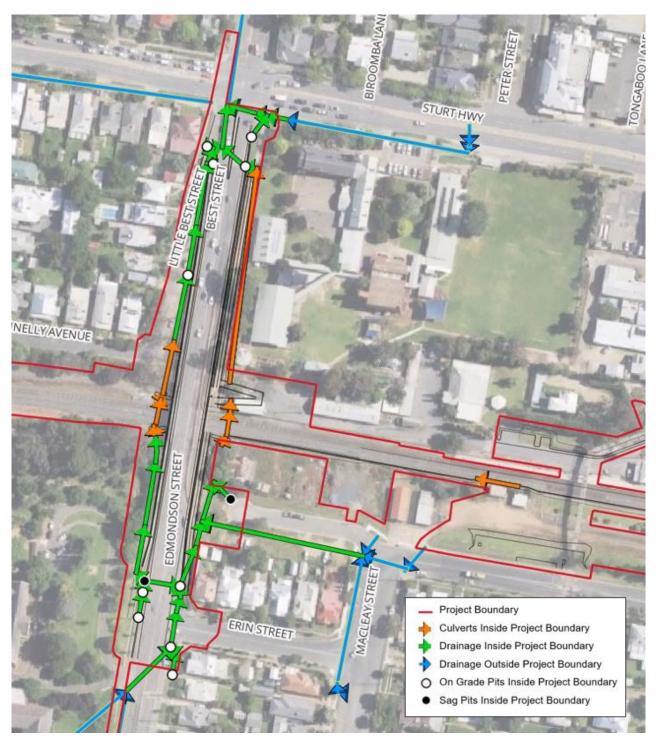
Culverts at Edmondson Street Bridge and Footbridge Site
